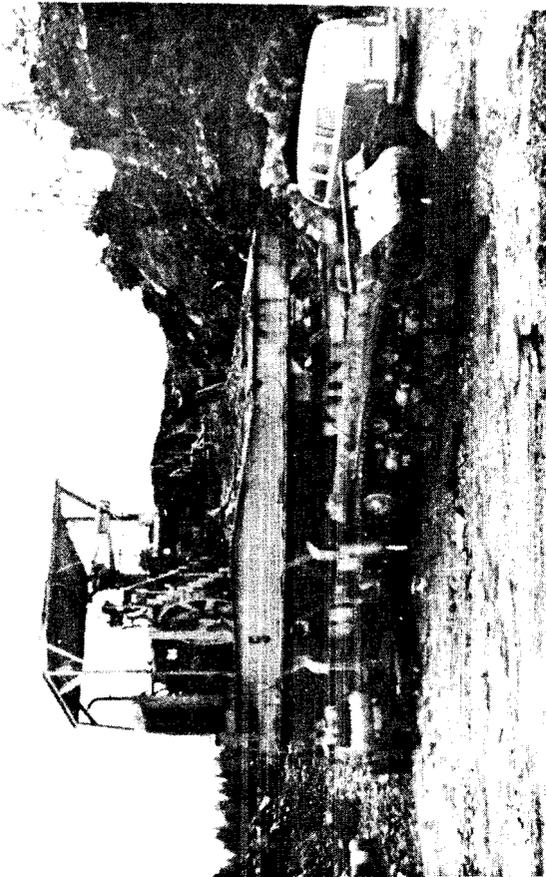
Rock Crushing Machine for Producing Logging Road Gravel.
